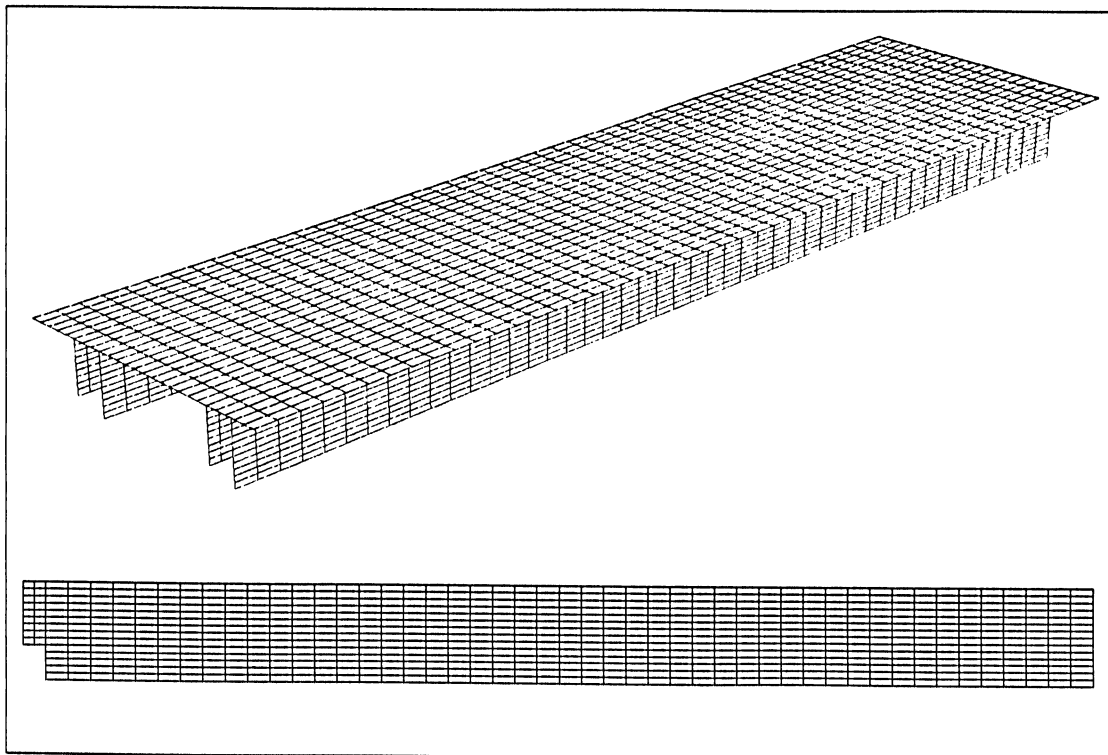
Finite element mesh for the DT-102A girder; full view (top) and elevation (below)
